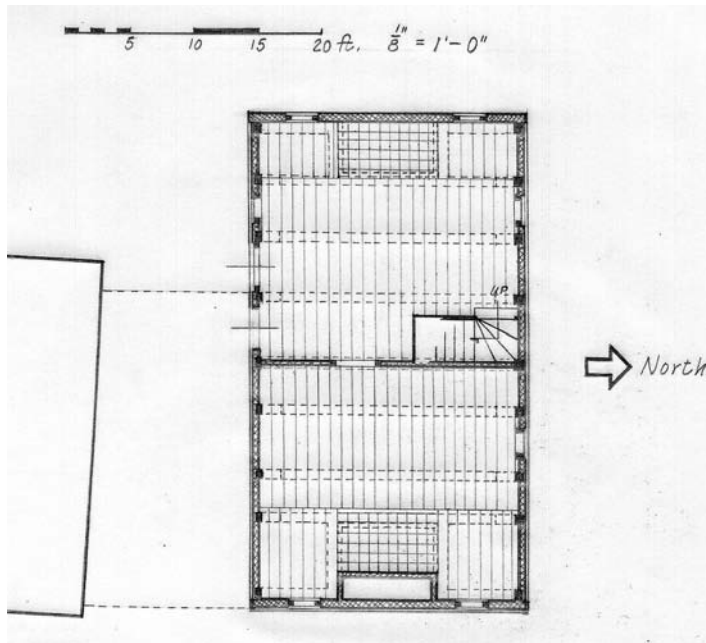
Fig. D – First floor plan of North House. Drawing by J.R. Stevens, 2013.
